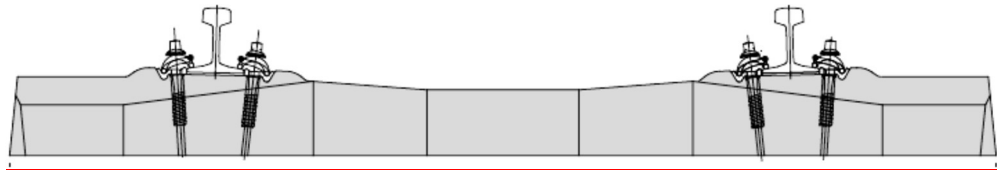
Prestressed mono-bloc-concrete sleeper
